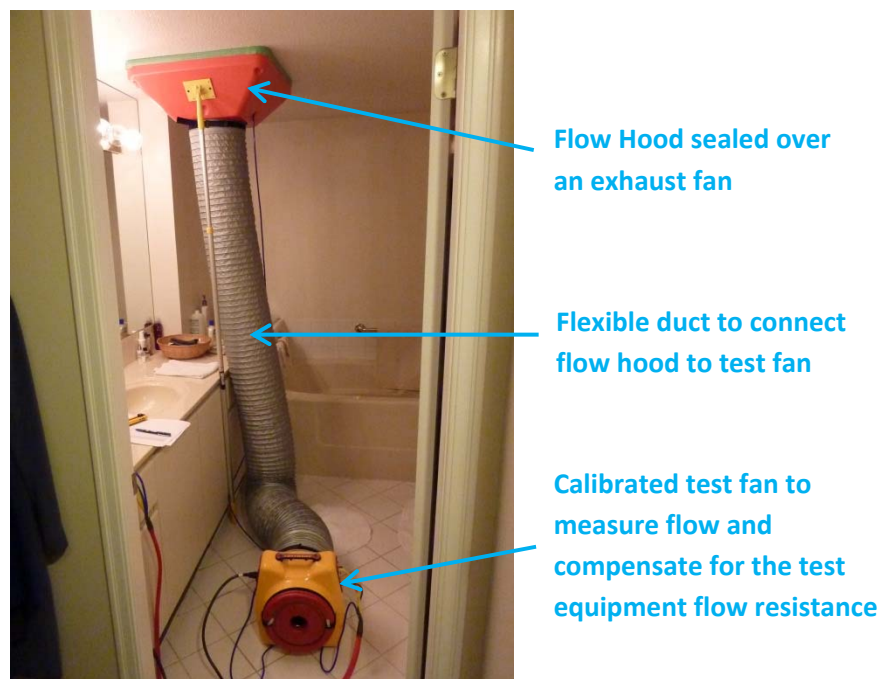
Photo of powered flow hood being used to test a bathroom fan at the case study building
